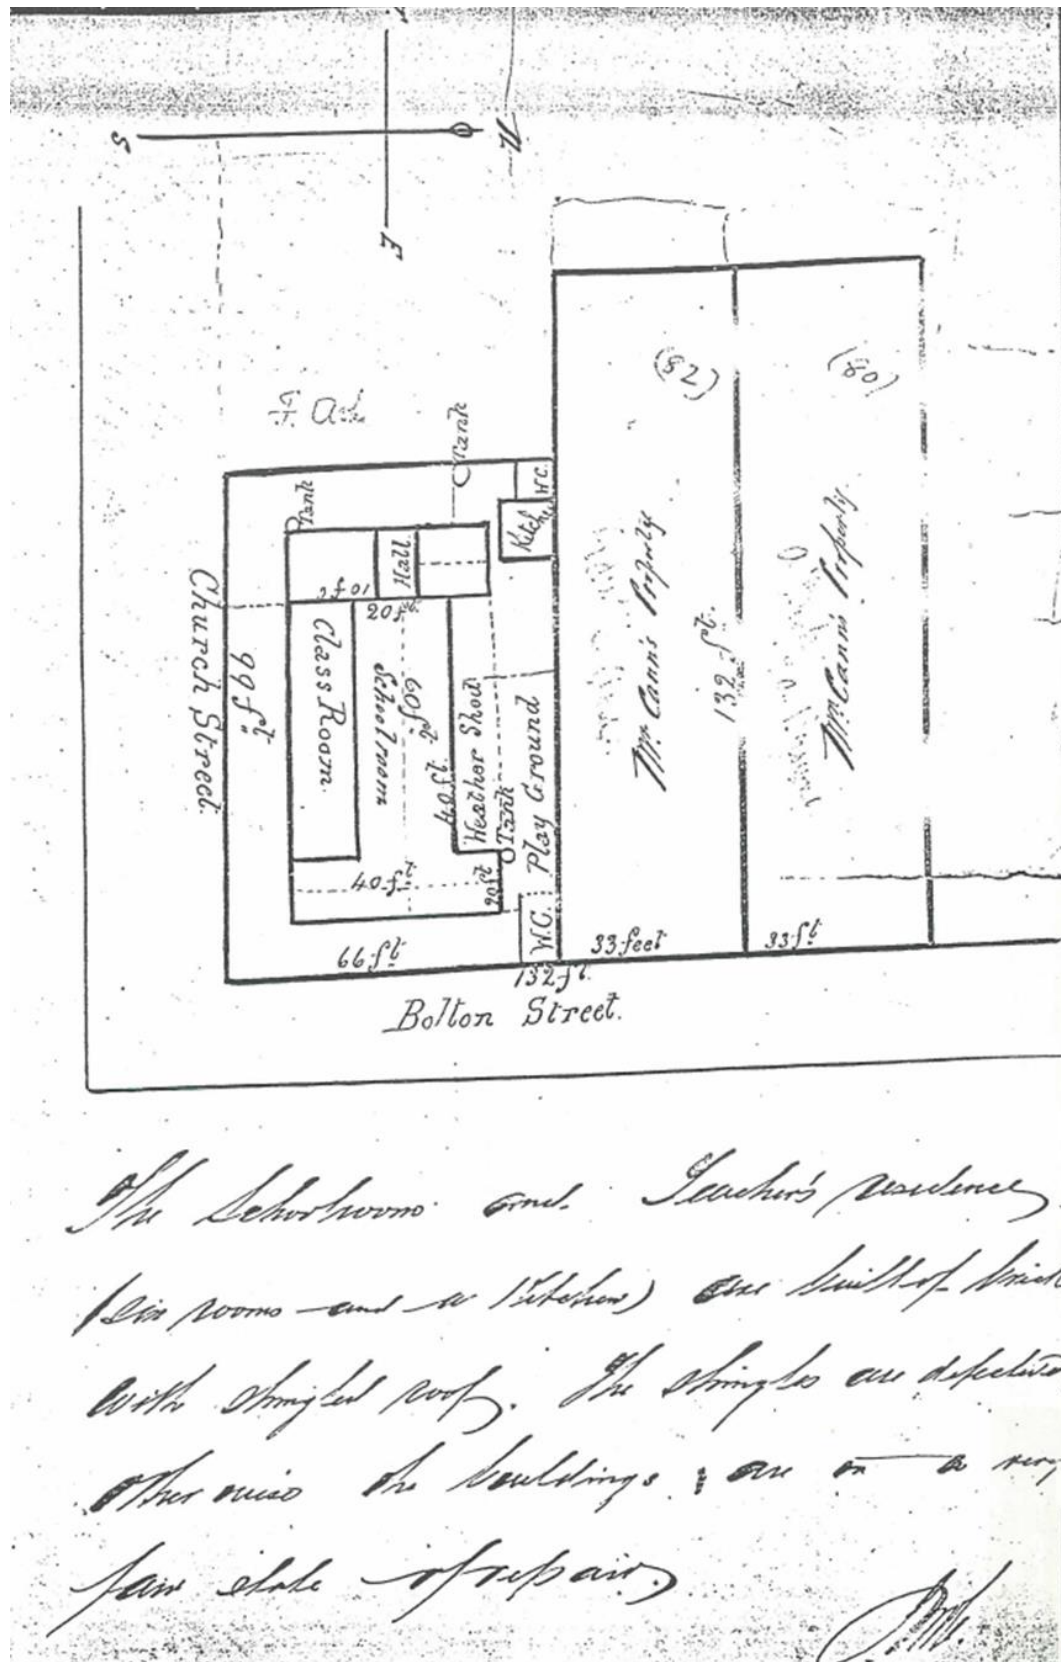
1882 sketch of school site by McCormack, Inspector for Department of Public Instruction.
